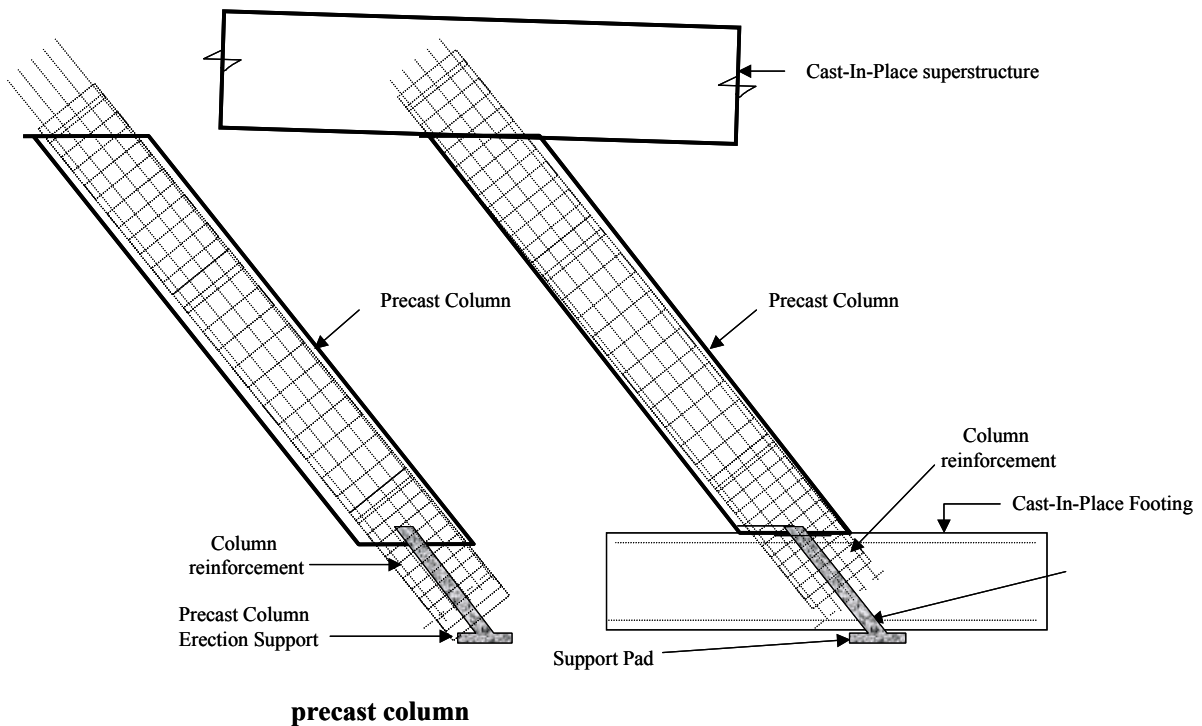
Slanted Precast Column on Spread Footing for a T-Girder Bridge
